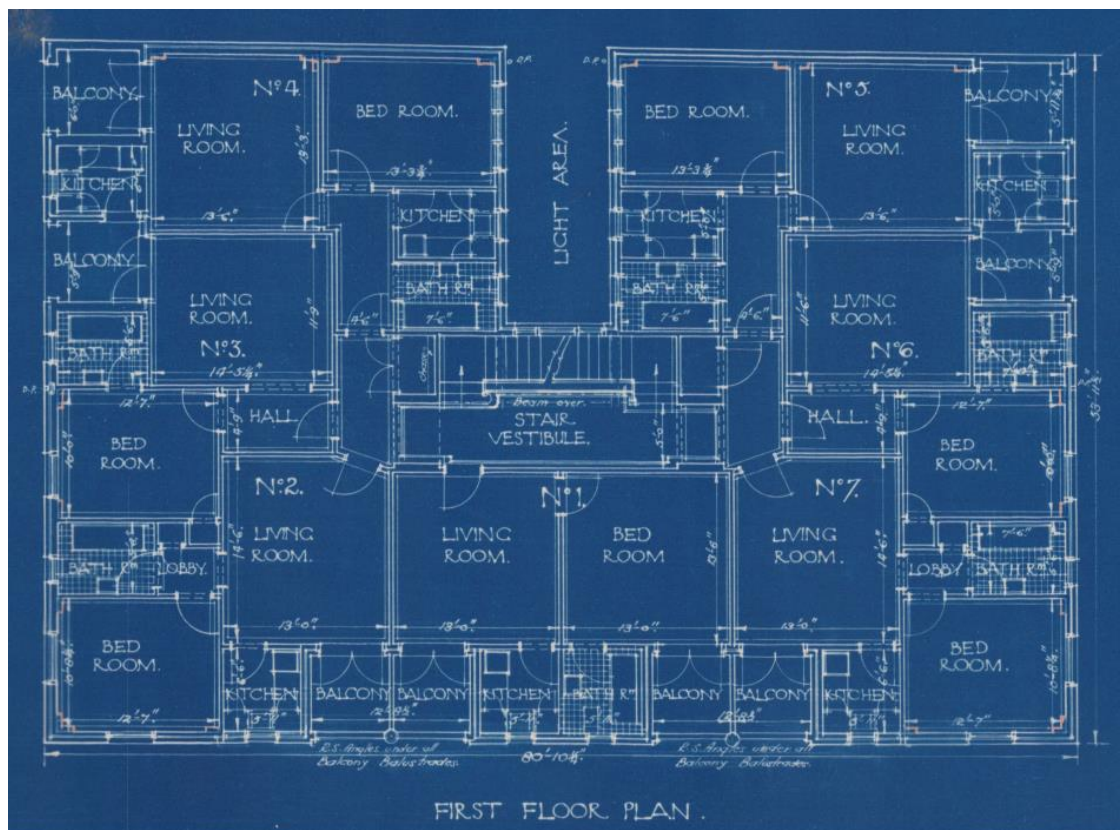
Original Level 1 floor plan and layout of Wilkinson House, 1926.
